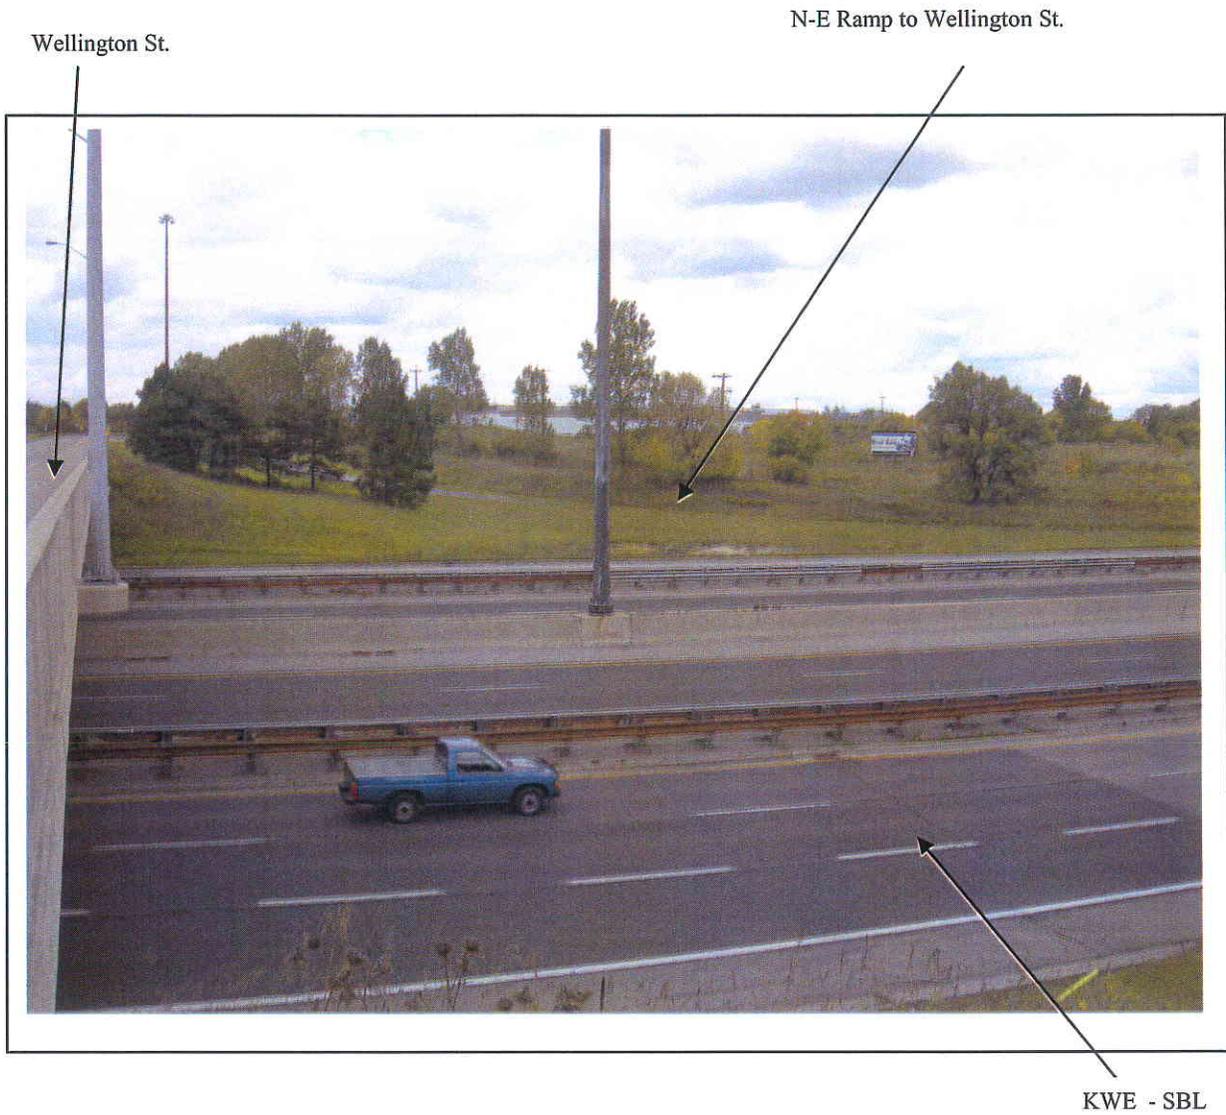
Looking at southeast quadrant of KWE & Wellington Street
